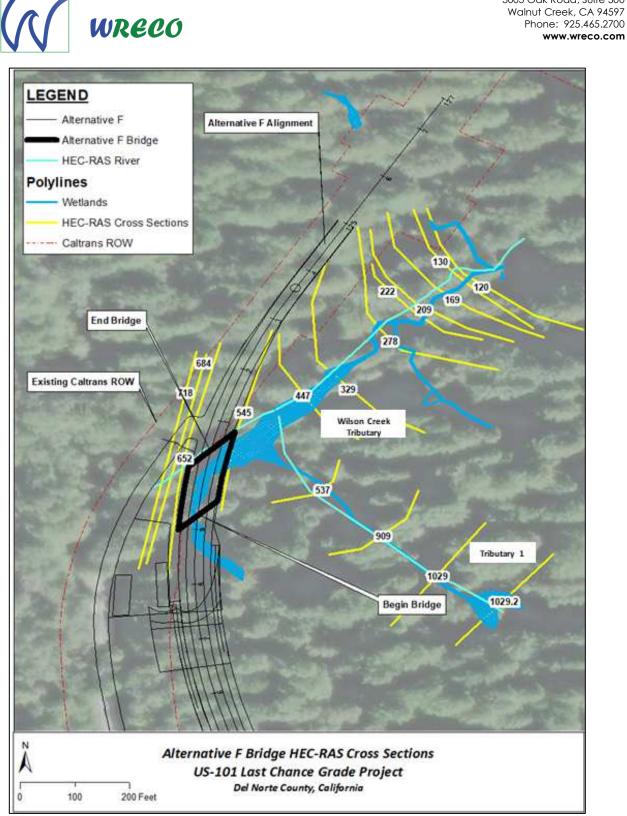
Alternative F Bridge HEC-RAS Cross Sections
